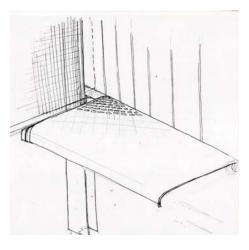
Steel bench. 76 dia round, hollow steel sections welded to main structure with 2mm perforated metal sheet seating bended to specification and, weldedto frame frame. Galvanised afterwards. Scale: Not to scale (Author, 2008)
